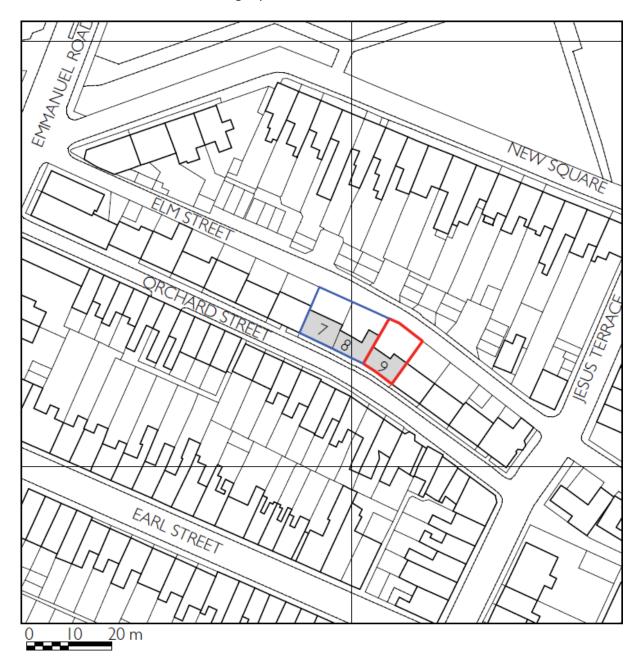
Site Plan of No. 9 Orchard Street. Courtesy of Haysom Ward and Miller Architects)
